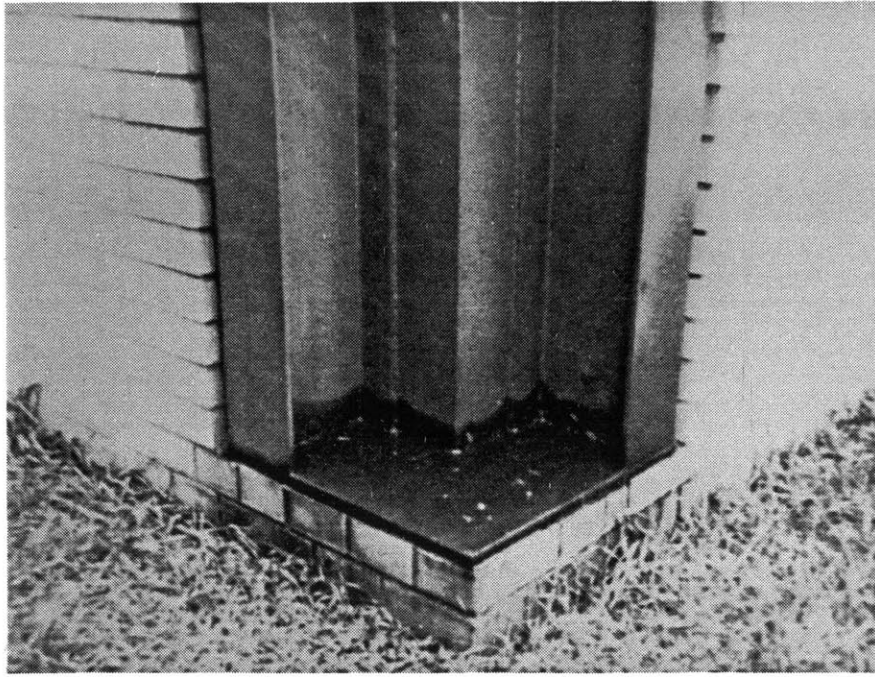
Building corner detail at IIT, Chicago. Mies. 1945
